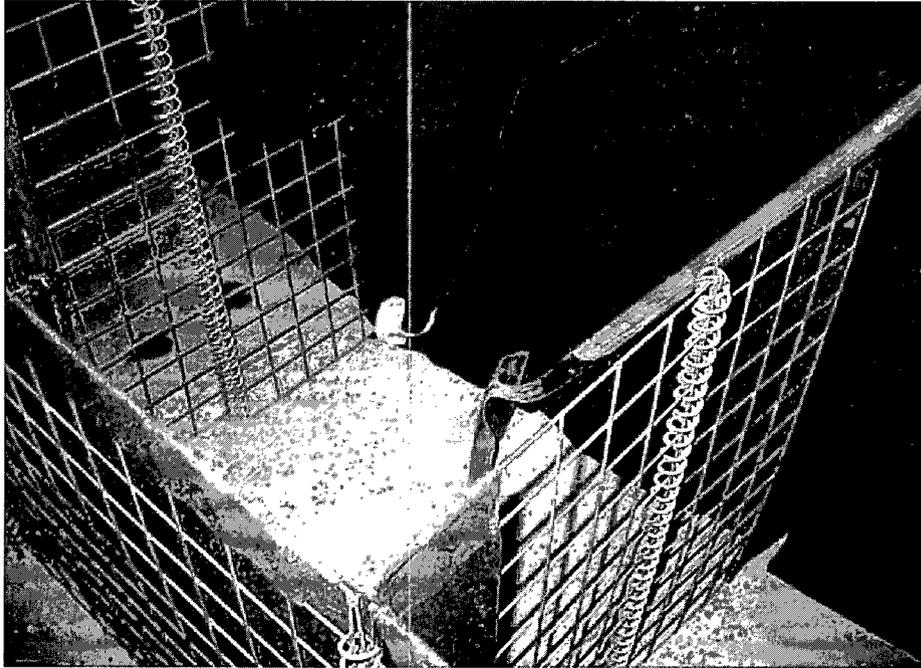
Securing flaps against concrete floor. Note center coils which are prefastened at factory
